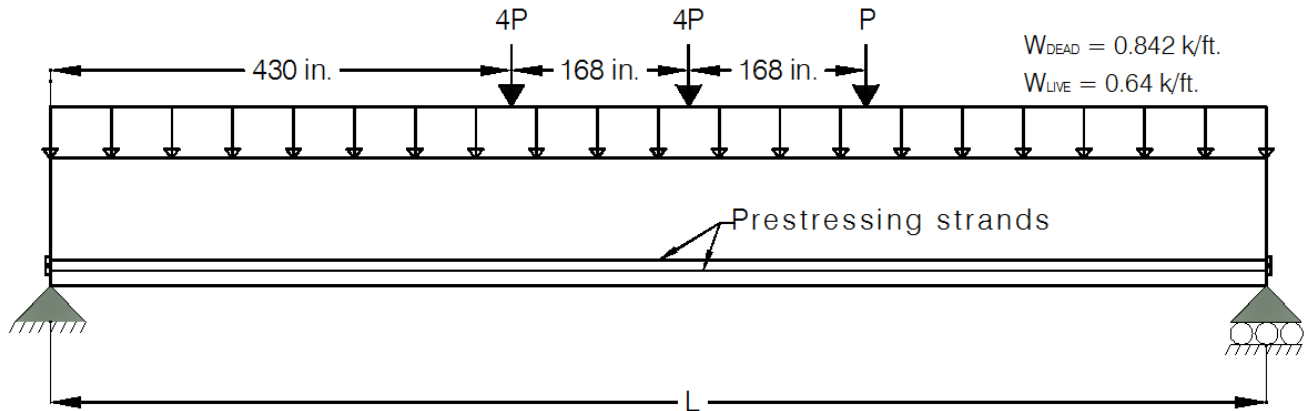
Prestressed concrete box beam with AASHTO-type loading
